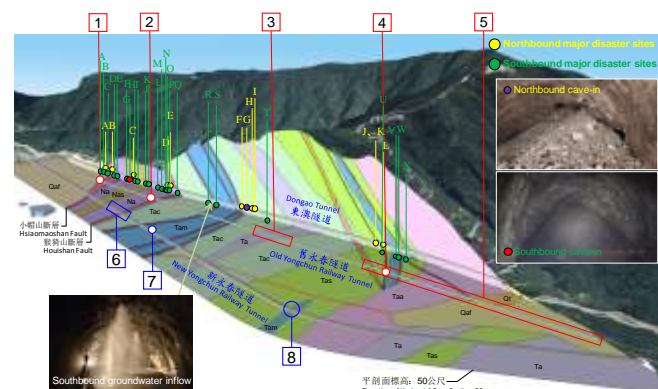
Comparison of major disaster sites of Yungchun Tunnel, New Yungchun Tunnel and Dongao Tunnel.
